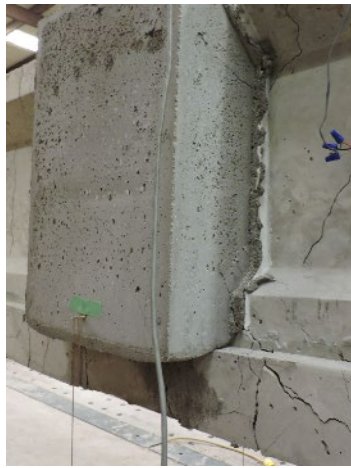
Specimen R2-PHOS joint cracking on the longitudinal and transverse faces from the back right
